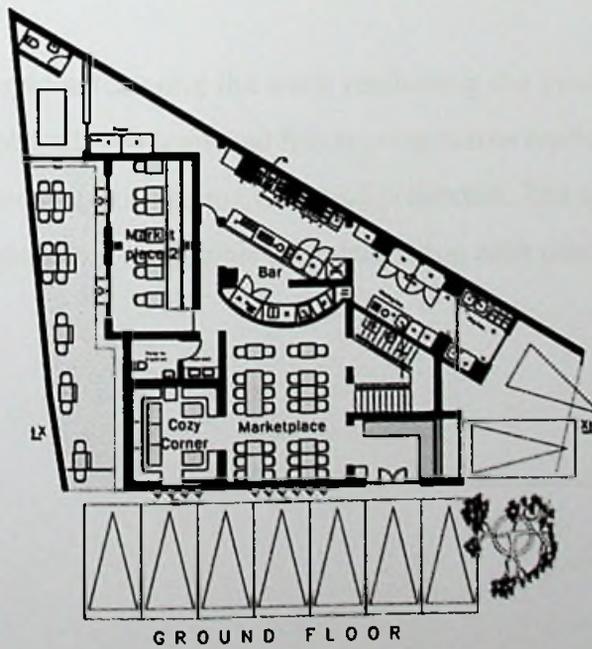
Manhattan Fish Market – Space planning – Ground floor (not to scale) See Appendix VIII
